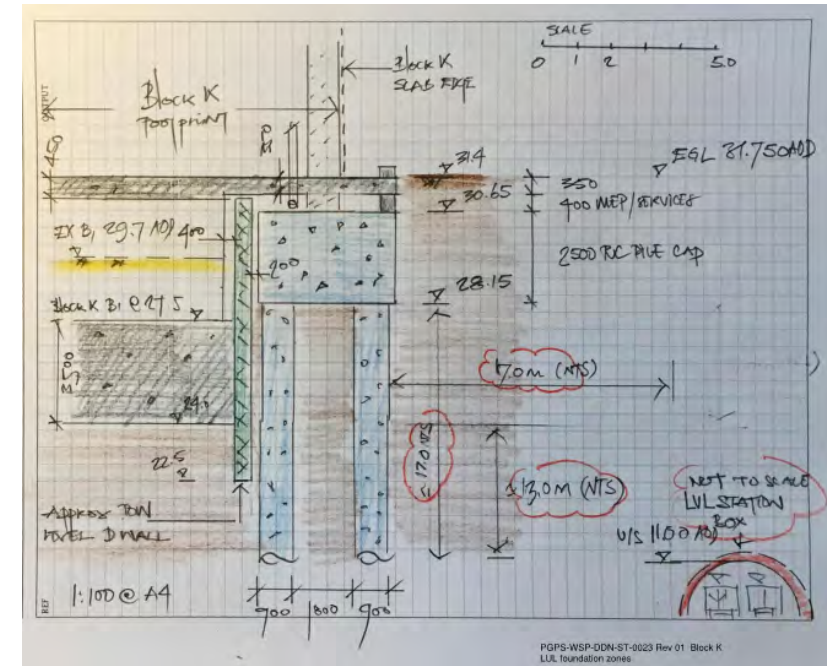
Typical Section – LUL asset and Proposed Basement
